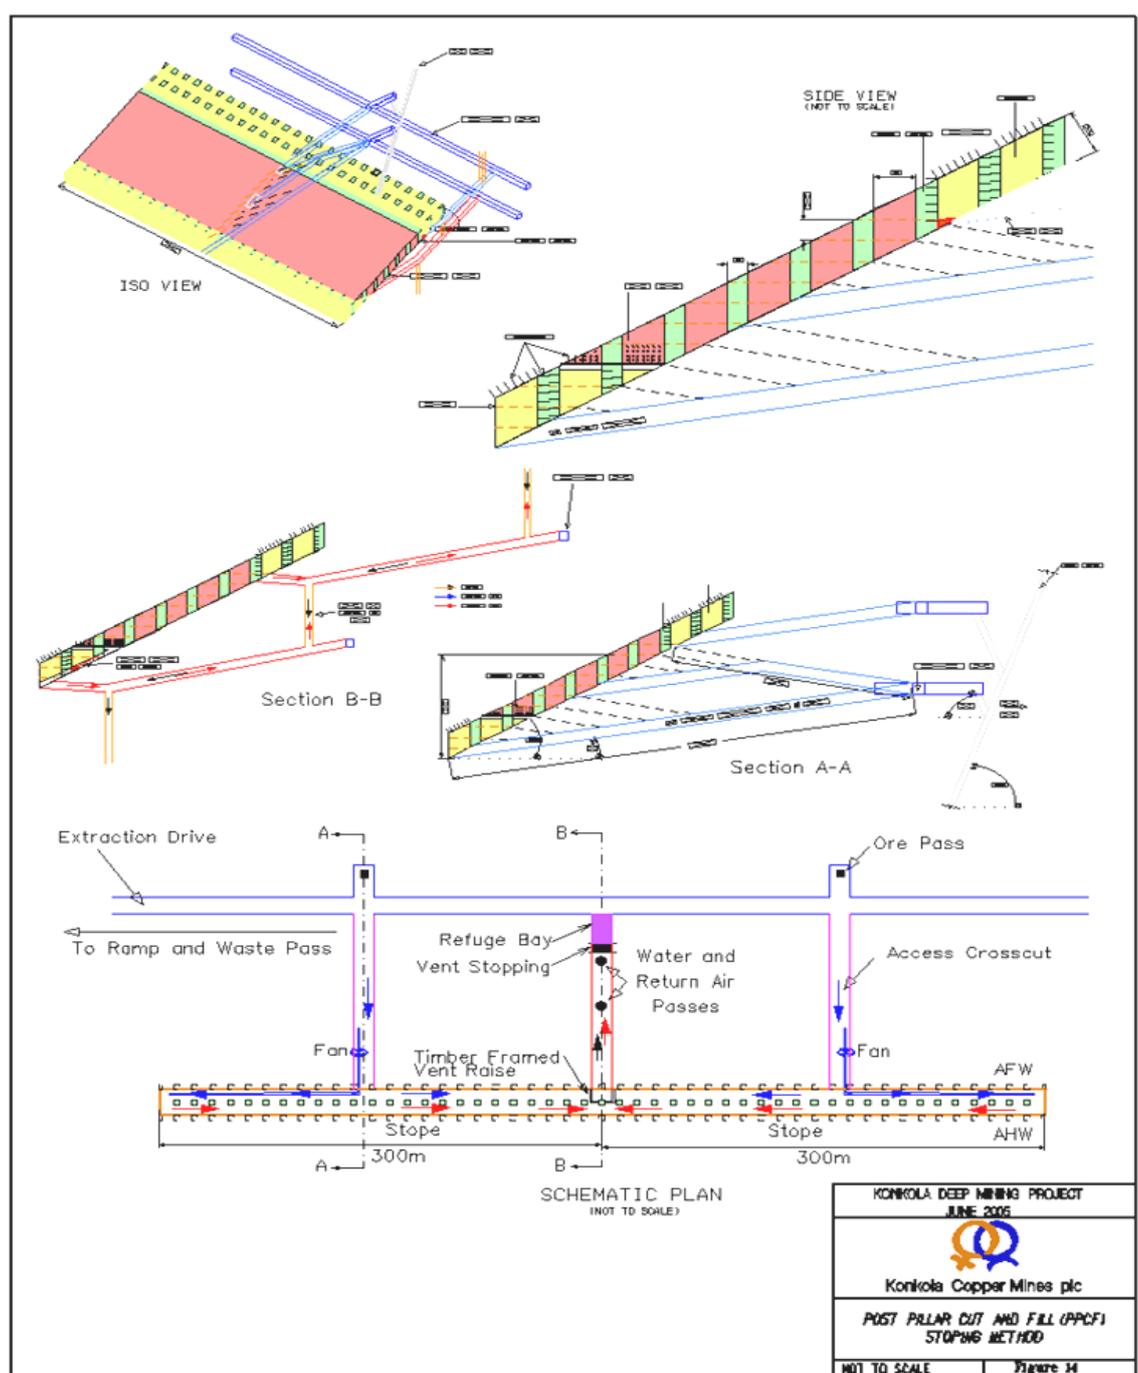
Post Pillar Cut and Fill (PPCF) mining method at No.3 Shaft underground mine
